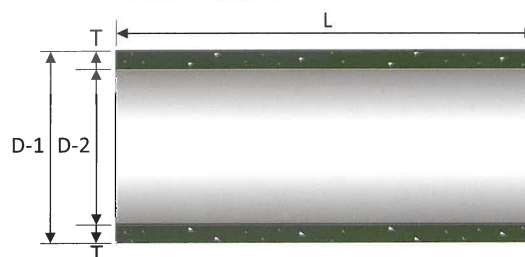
Typical cross section of Butt Jointed Concrete Pipe
